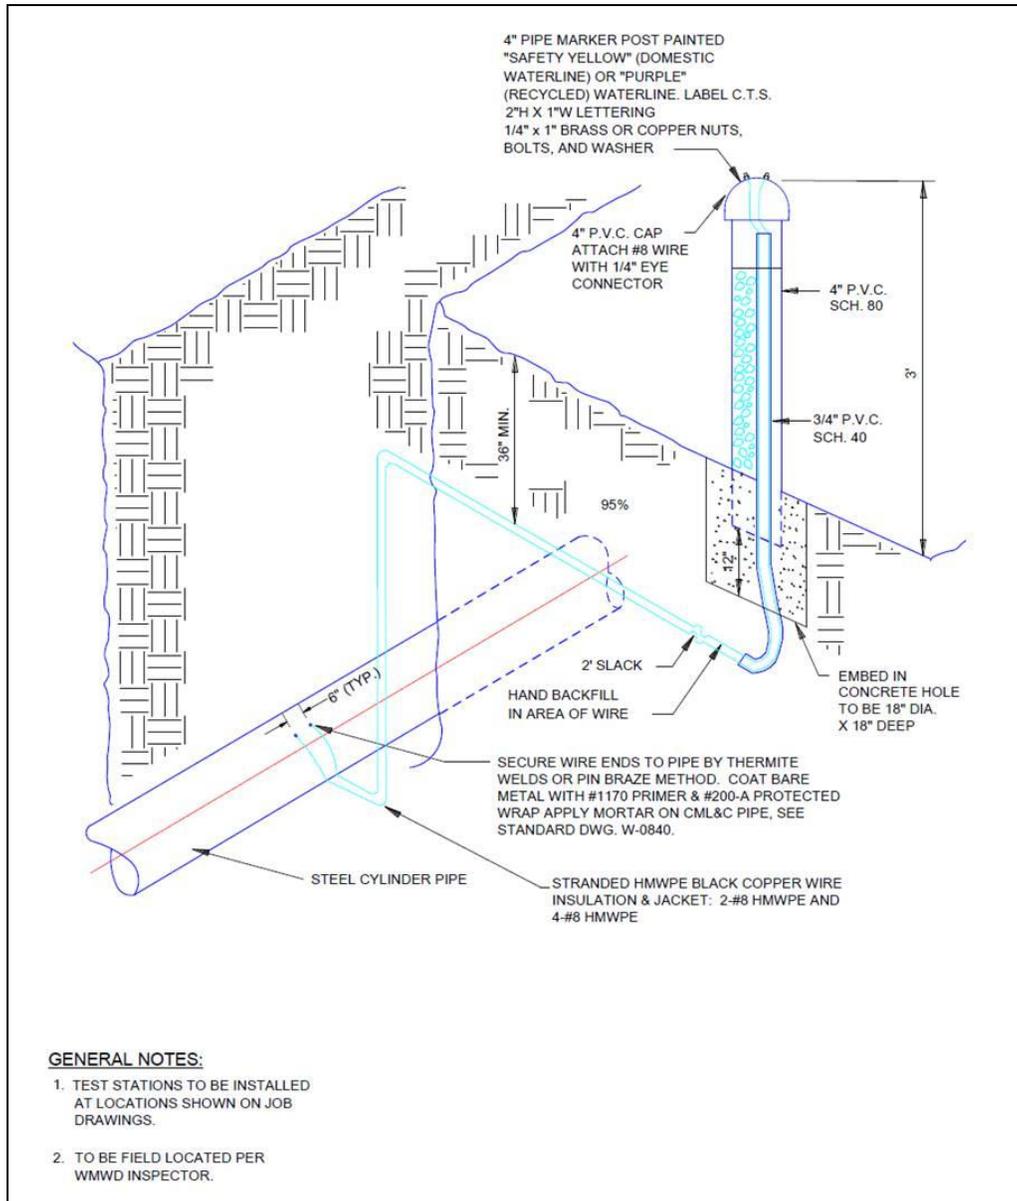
CATHODIC PROTECTION ABOVE GROUND TEST STATION STEEL CYLINDER PIPE
